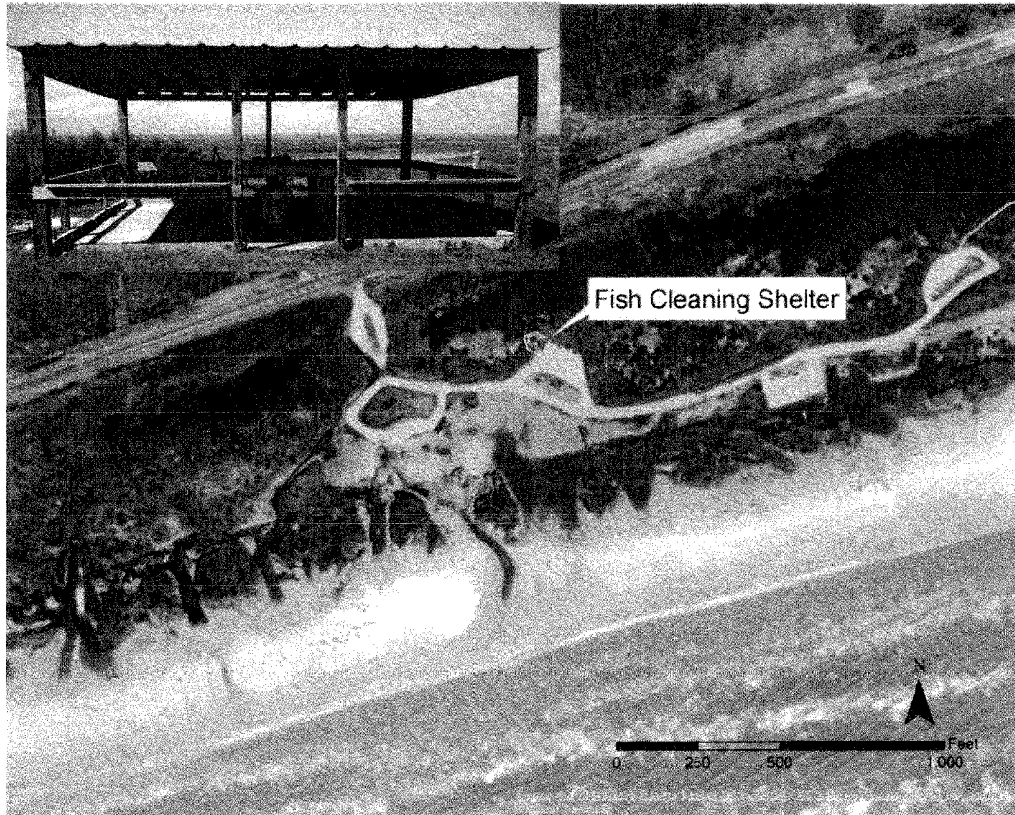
Location of the fishing cleaning shelter with an example of a fish cleaning shelter. Red shading indicates permanent construction impacts and yellow hatchmarks indicate temporary construction impacts.
